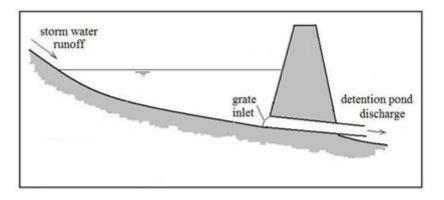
Storm water detention pond with pipe outlet control²⁴⁴.
